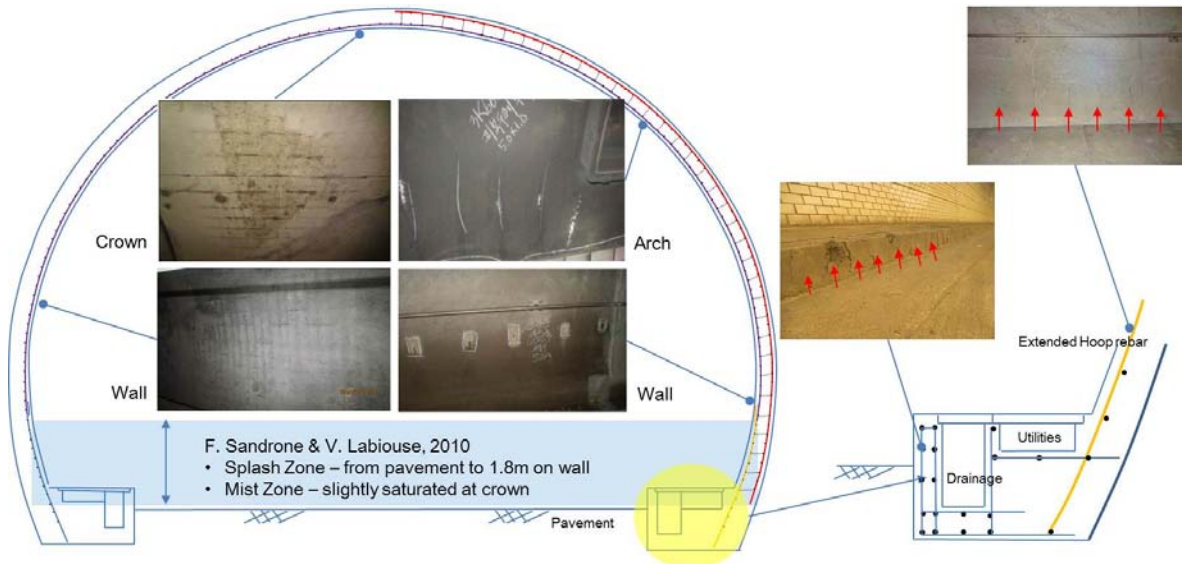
Typical reinforcement exposures in reinforced NATM tunnel
